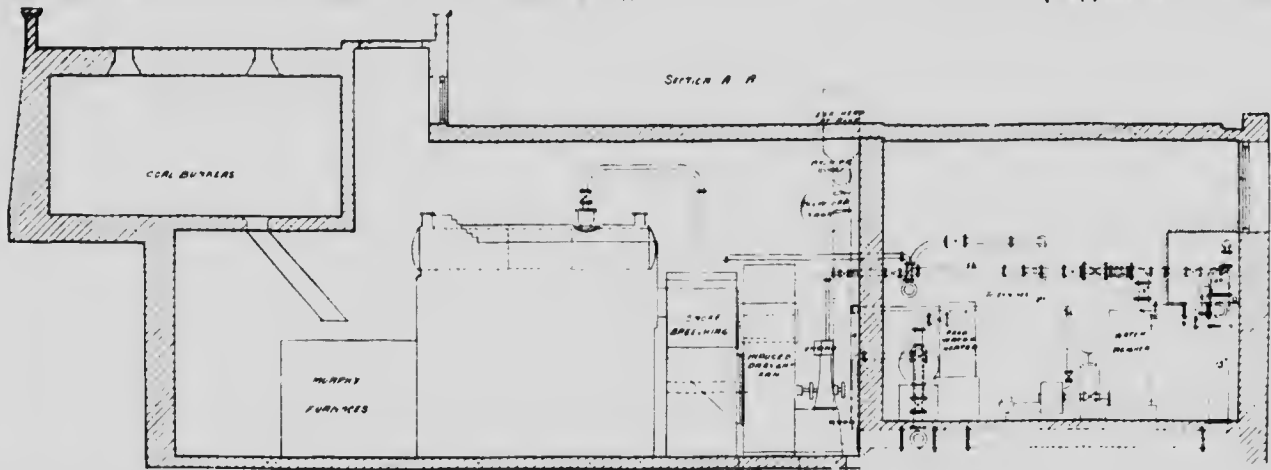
SECTION OF POWER HOUSE BUILDING SHOWING ELEVATIONS OF THE VARIOUS UNITS OF EQUIPMENT.
